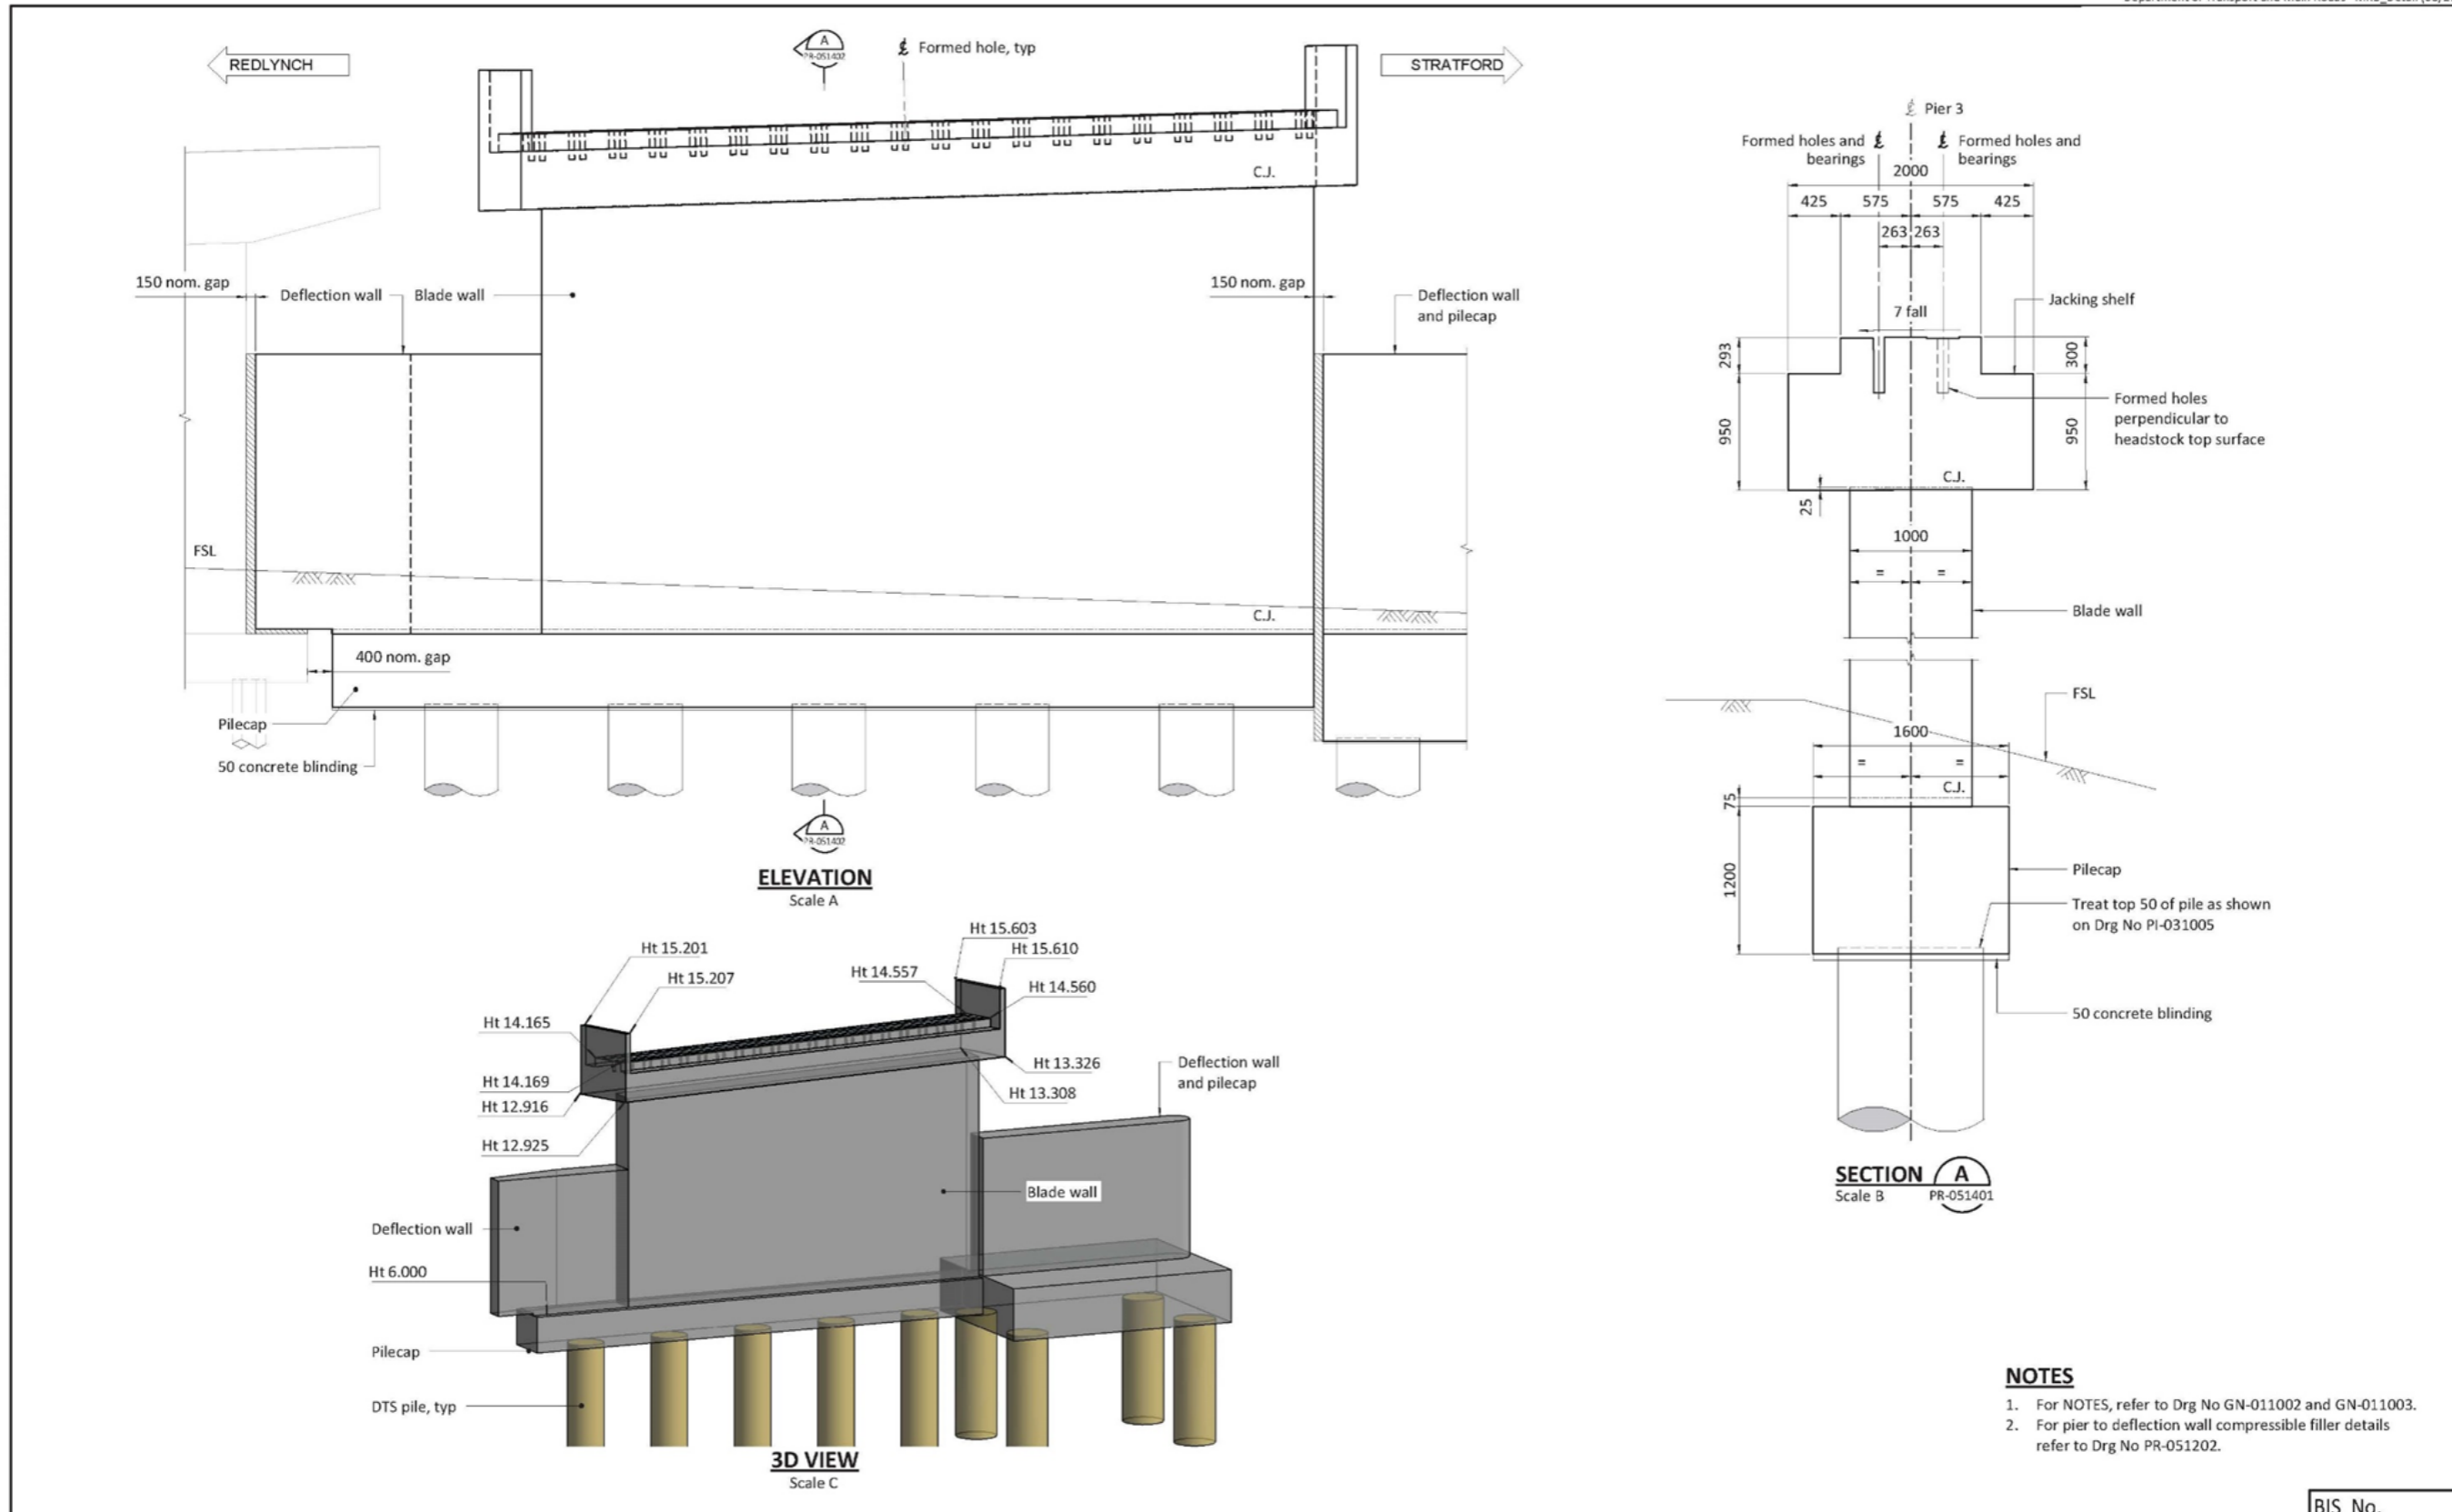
(n) - Example pier drawings for deck unit skewed bridge - Sheet 2 - elevation and section
